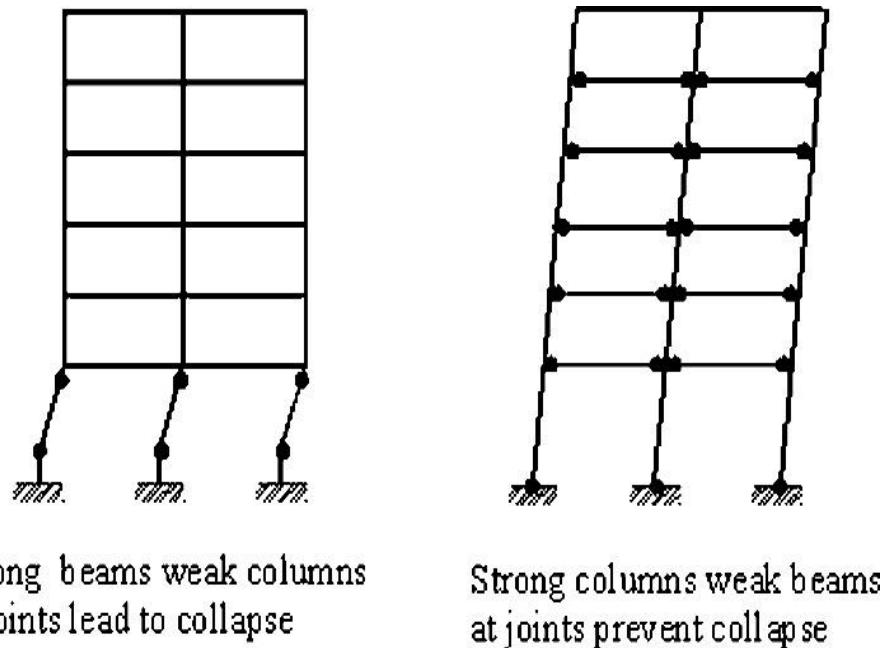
Strong beam-weak column and strong column-weak beam failures (Ergin Atimtay,2006)
